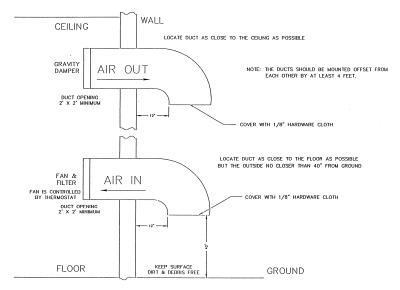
Typical 1 kW Minimum Ventilation Configuration
